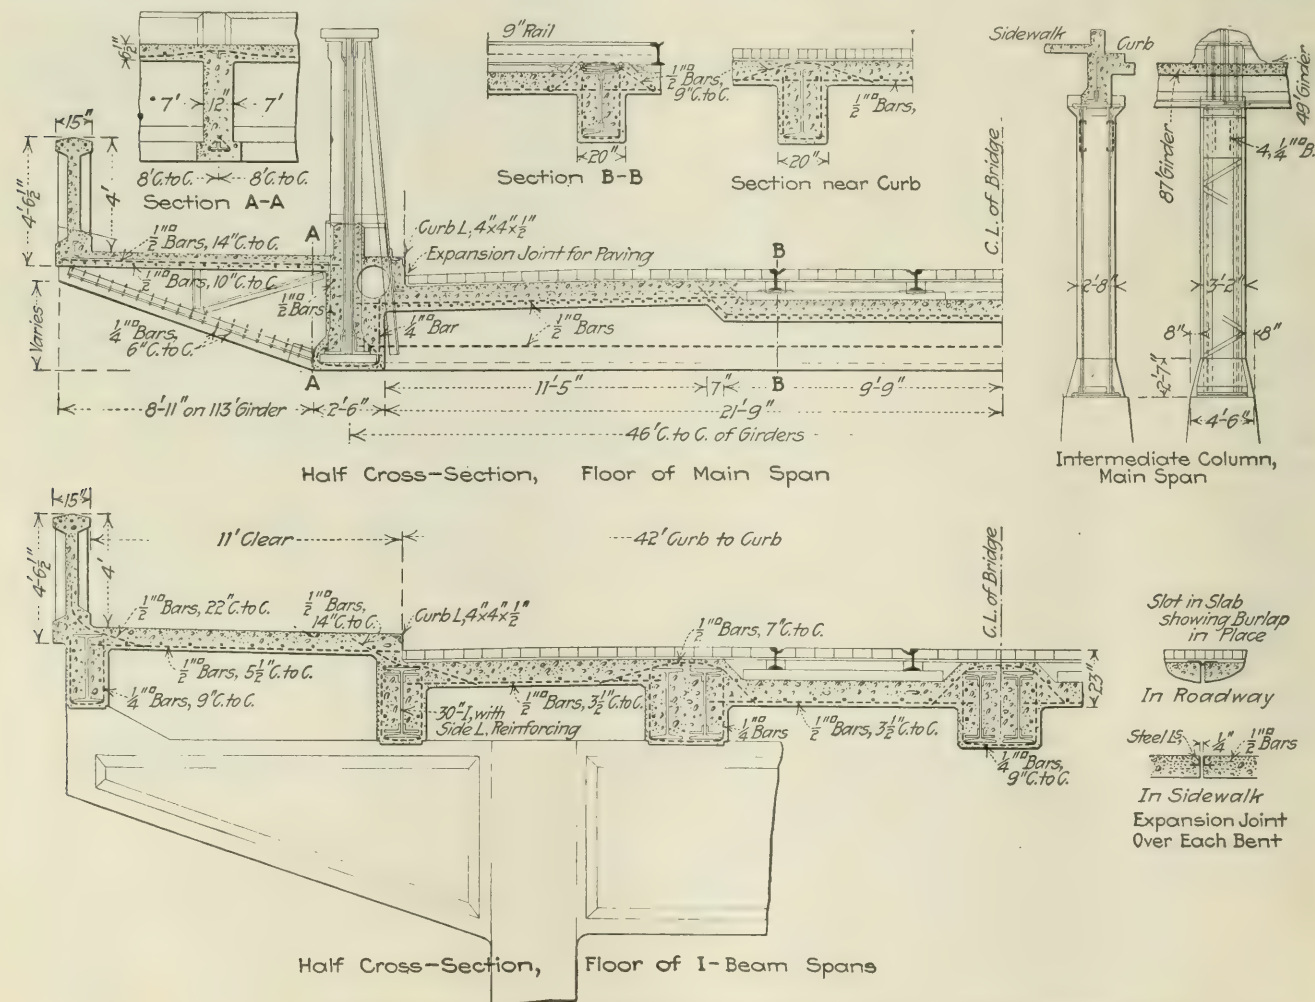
TWO REINFORCED-CONCRETE SLAB ARRANGEMENTS, USED IN THE VIADUCT FLOOR
